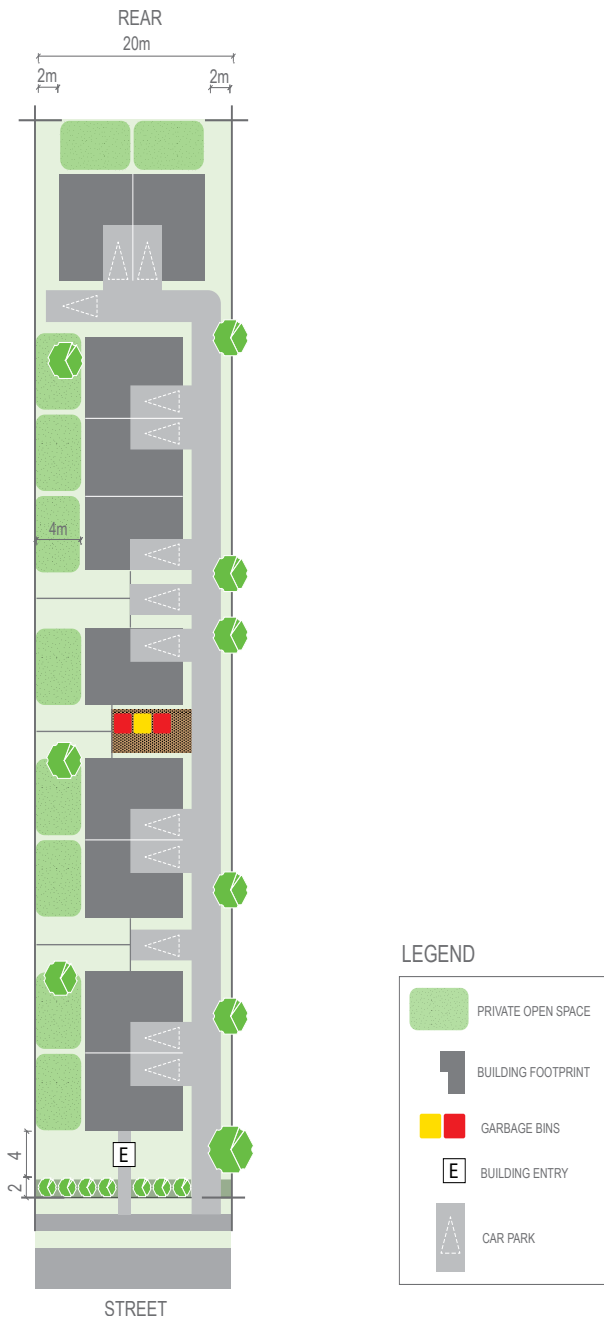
The access road has been positioned to the west of the buildings so that the private side alfresco/courtyards and living spaces for the units can benefit from natural light and ventilation from the north and east
